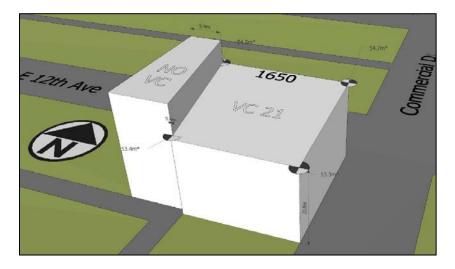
Perspective looking southwest from the corner of Commercial Drive and E 12th Ave
